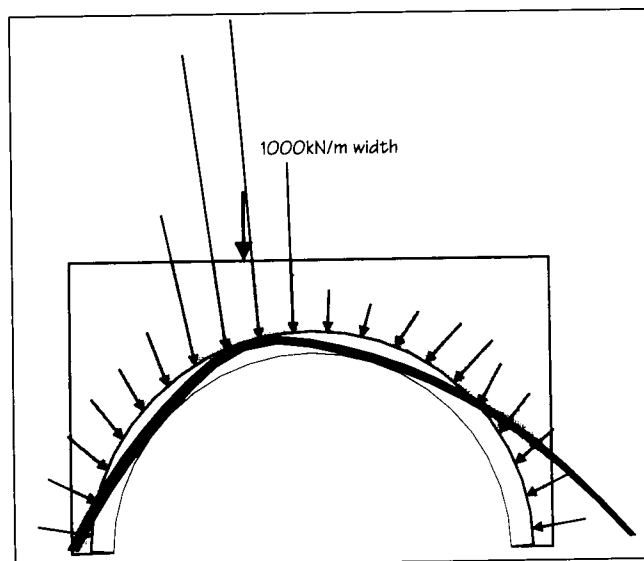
Assuming masonry backing to quarter point for bridge at Bargower.
